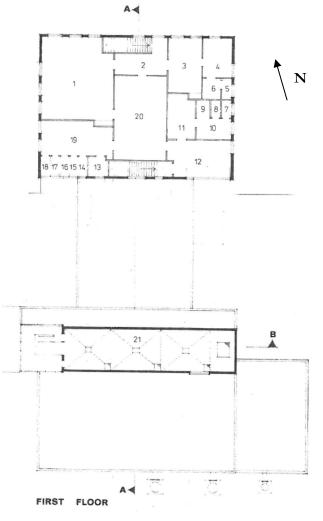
Boiler House, Maintenance Building – First Floor Plan
